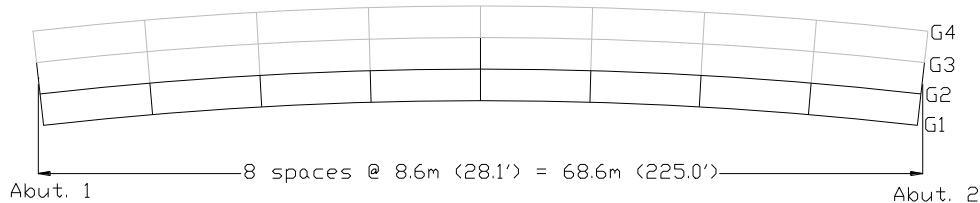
Stage 1 of Construction for Paired Girder (Inner Girders Placed First) Erection of Single-Span, 4-Girder, 305-m (1000-ft) Radius Bridge.
